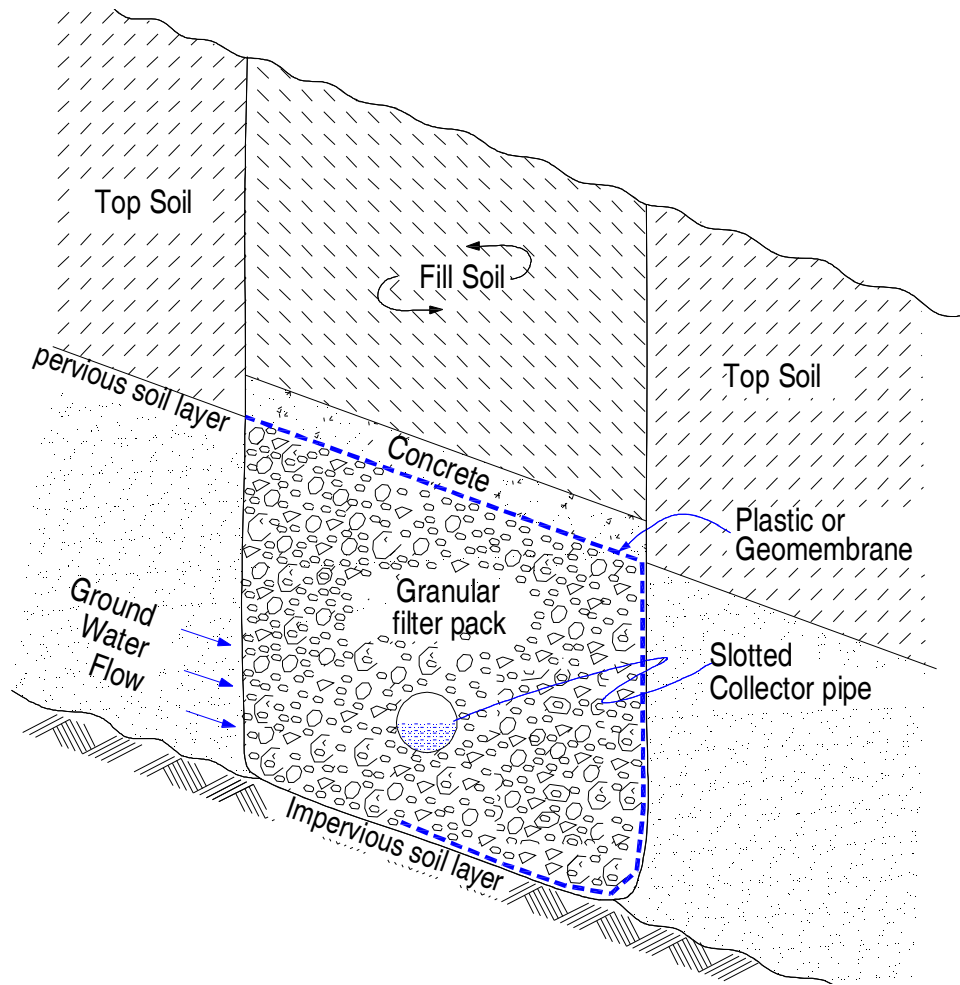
Cross-Section of a Typical Hillside Trench Collector
